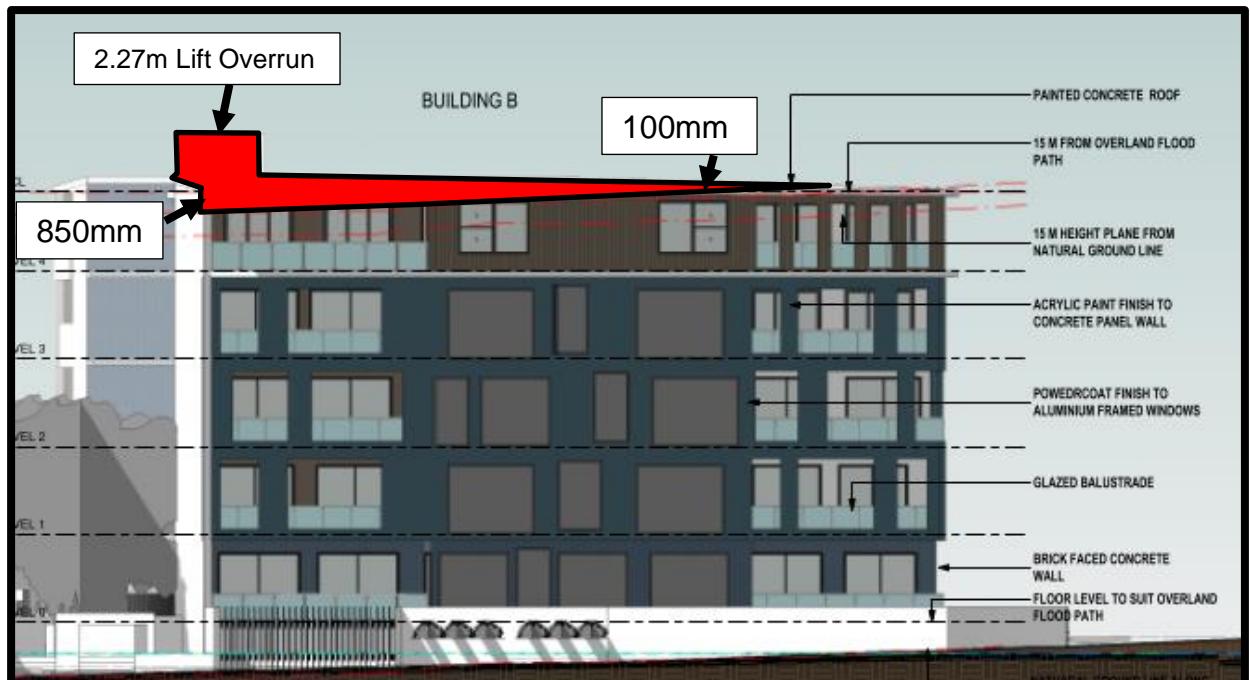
Height Exceedance from proposed FFL from south elevation Building B (post-fill)
